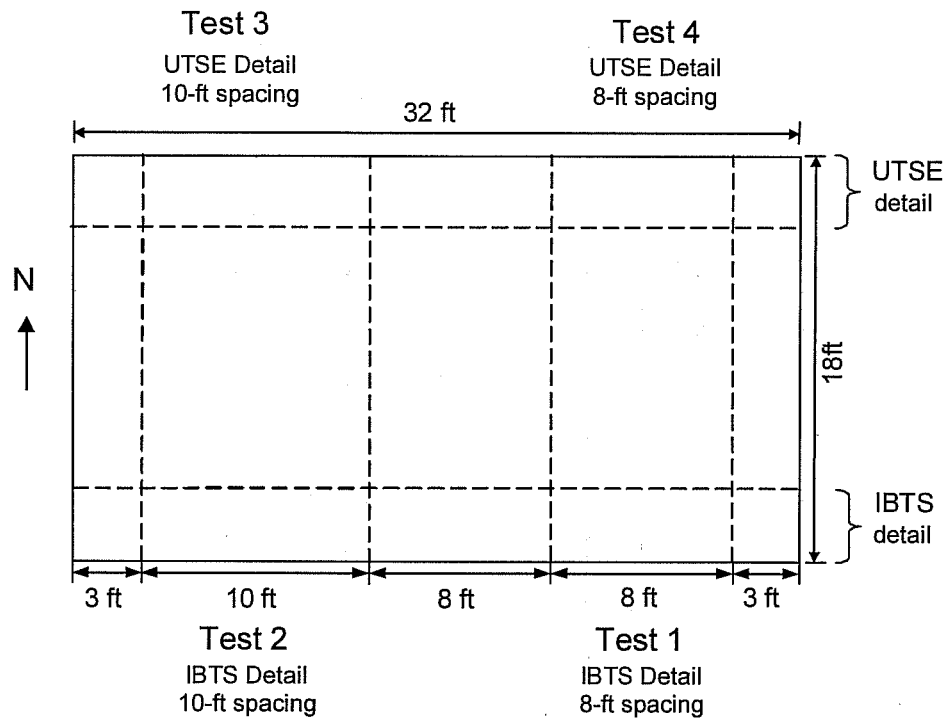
0° skew specimen, plan view (Ryan 2003)
